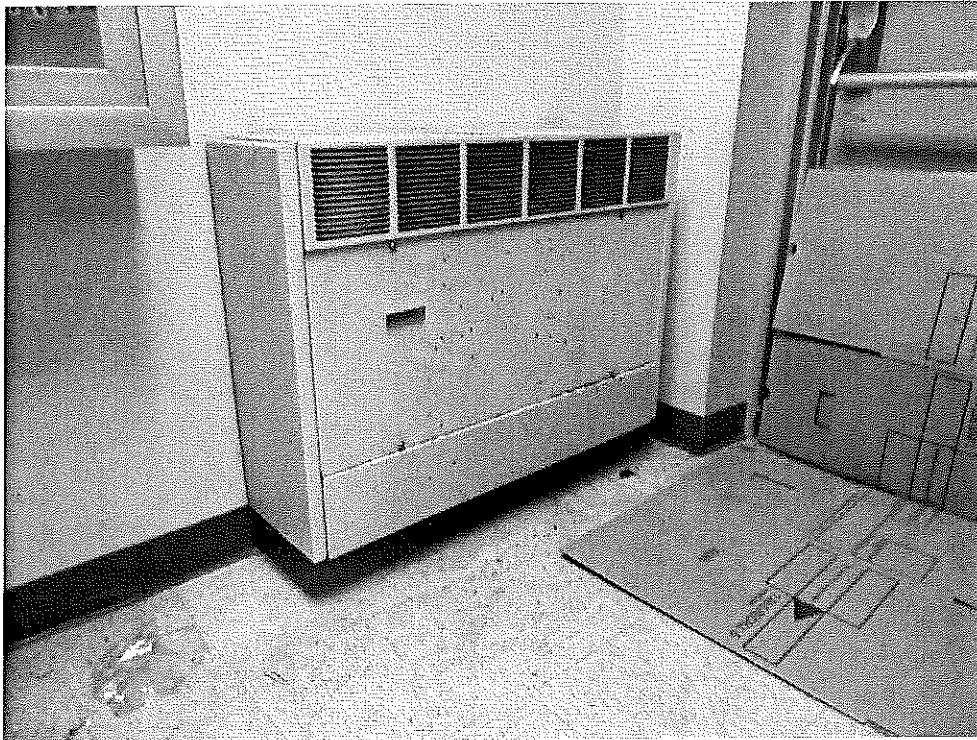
Stairwell Cabinet Unit Heater (Typical)
